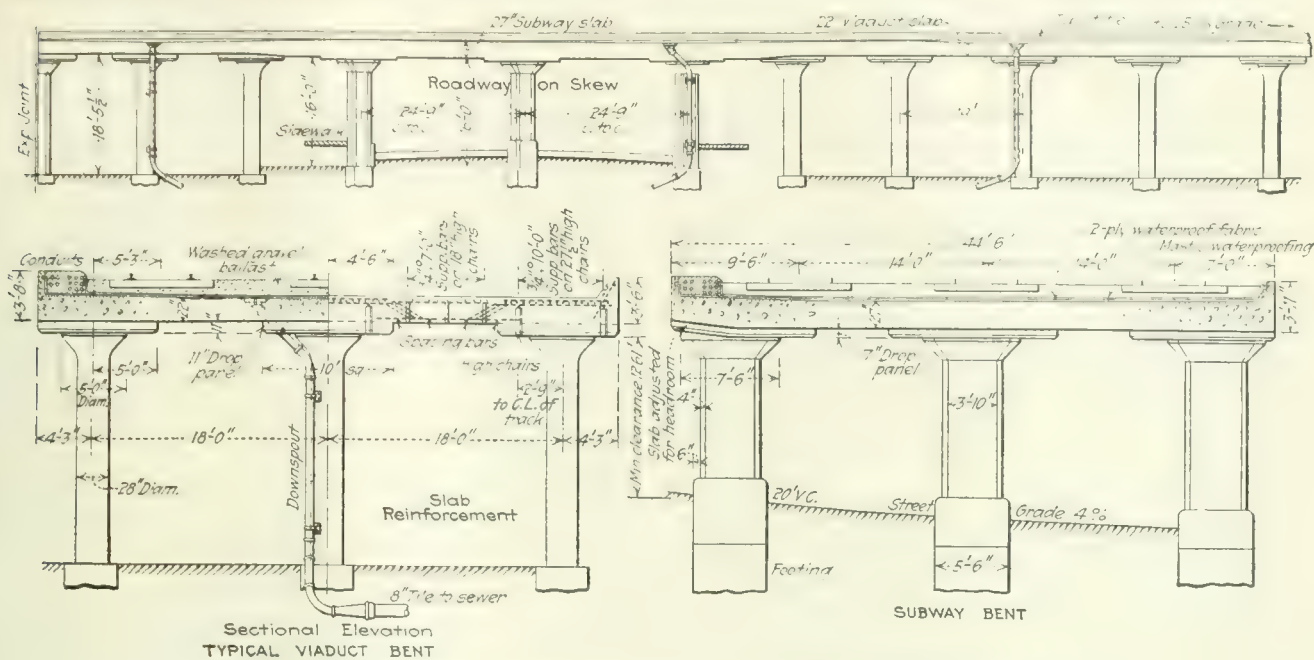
THREE-TRACK CONCRETE VIADUCT, WITH SUBWAYS
